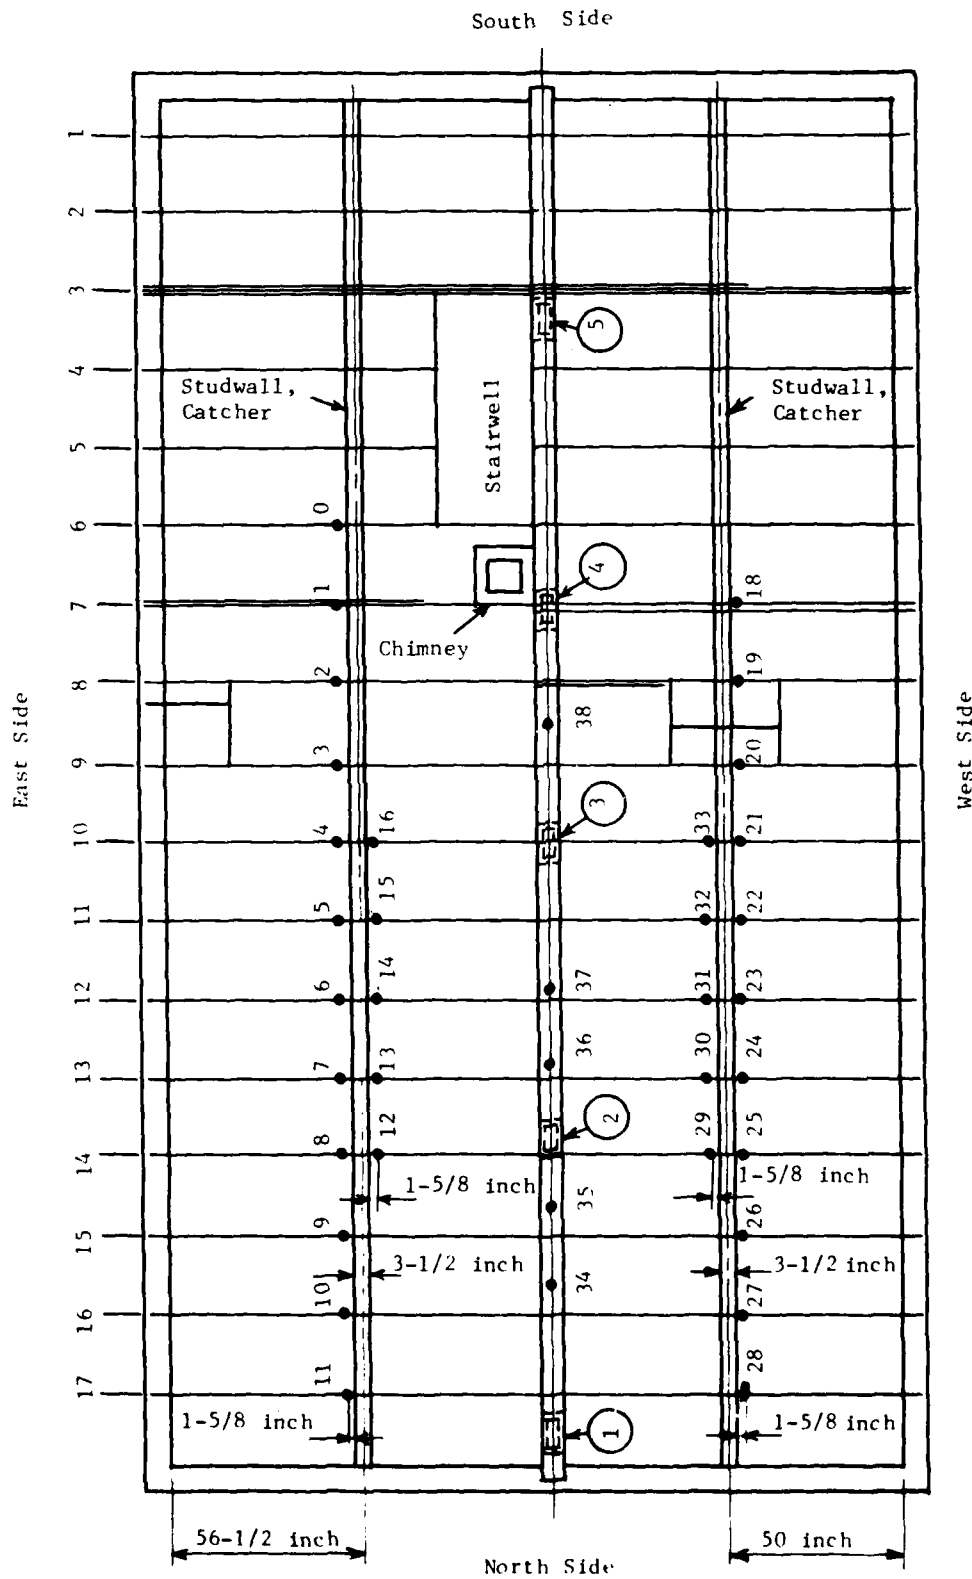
Deflection Measurement Instrumentation Layout, First Load Test
